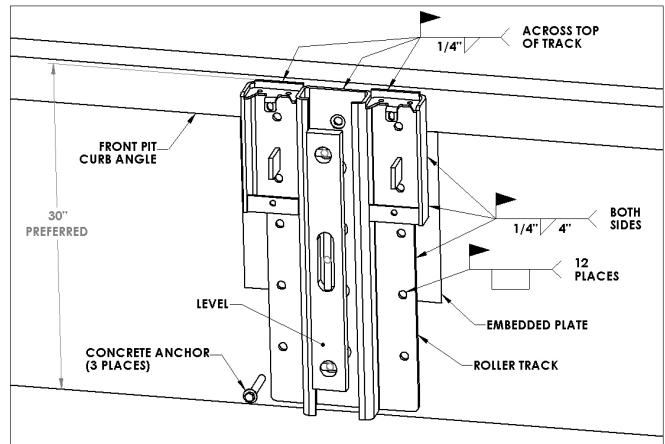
WELDING ROLLER TRACK FRONT VIEW
